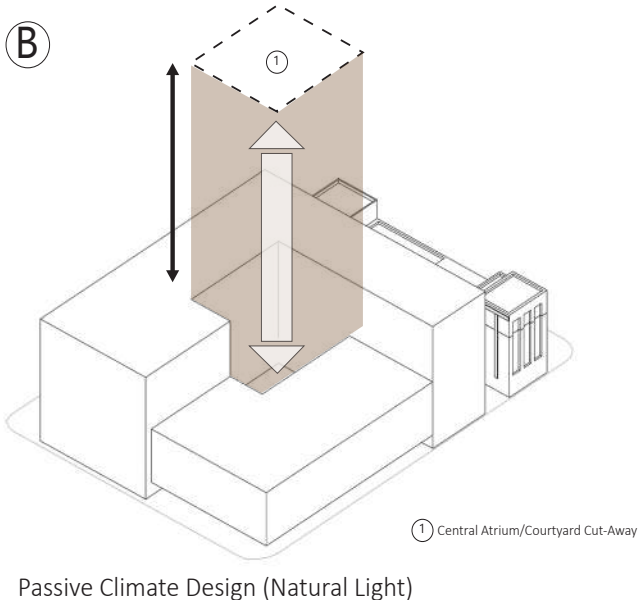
(v): Axonometric Drawing showing Existing Building and its Spatial layout , (Author 2020).
